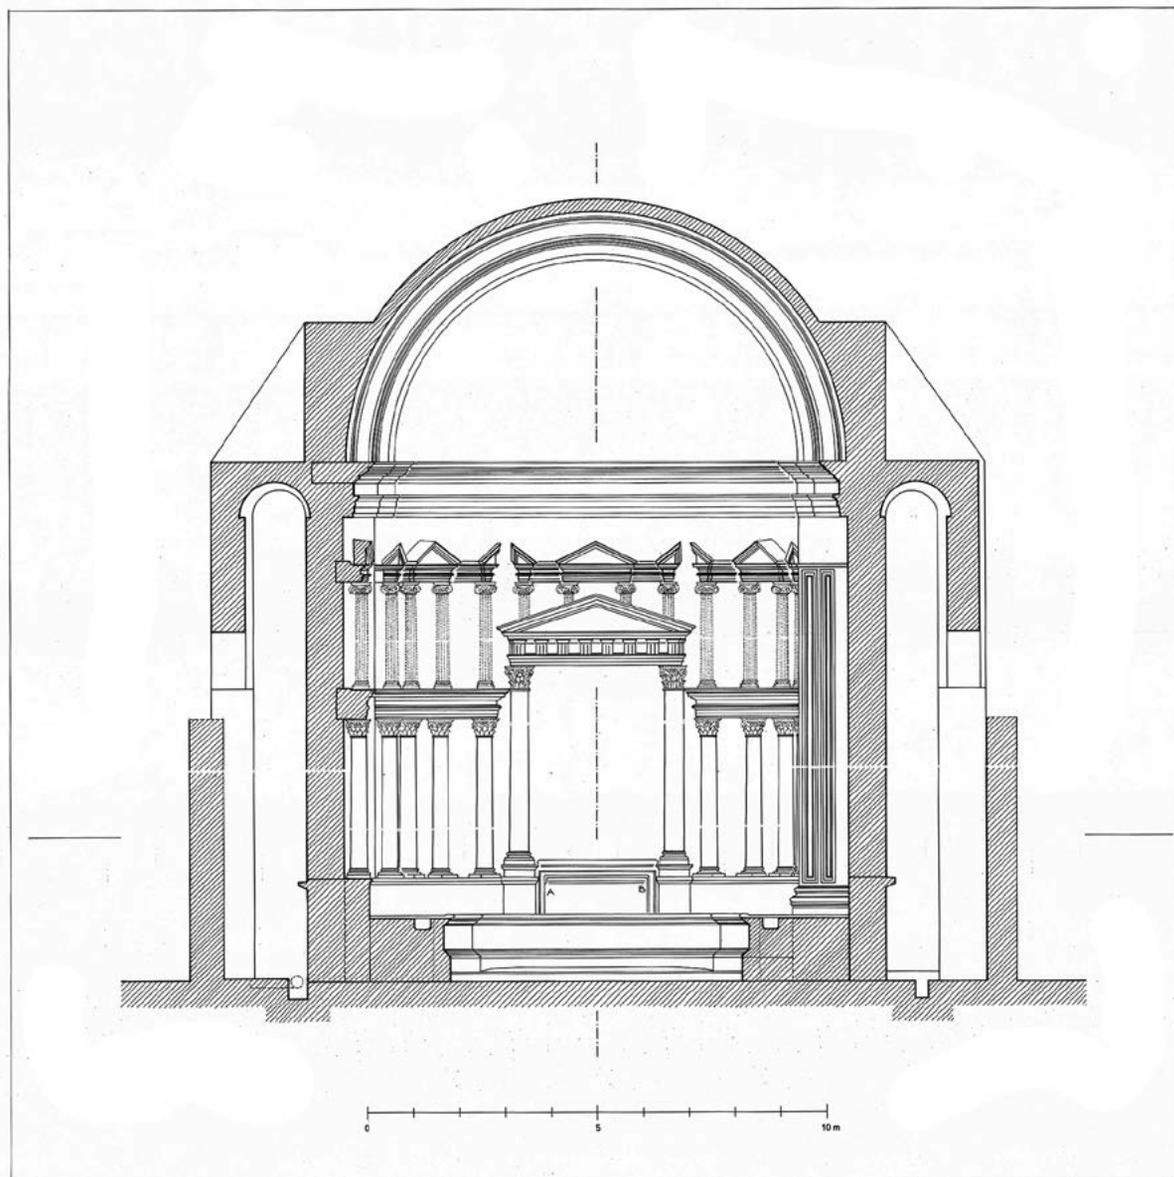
Apamea, Nymphaeum. Section North-South reconstructed (© CBRAP).
